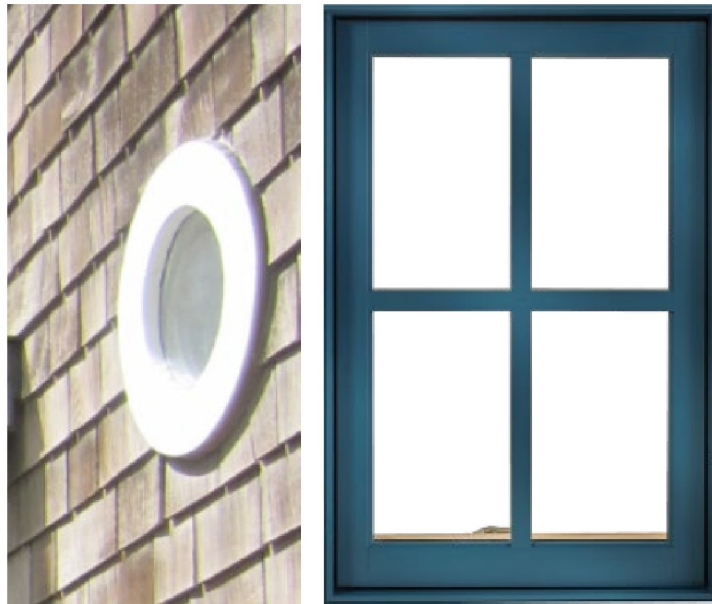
Single window to remain unchanged (L); example of Sierra Pacific Windows aluminum-clad wood window (R)
